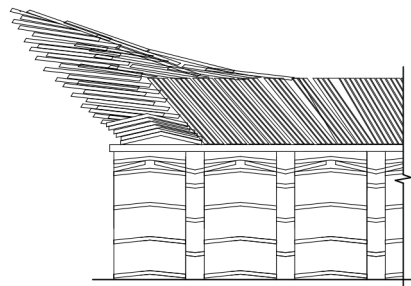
Detail Drawing of the Conner of Main Ridge Ornament Scale 1:20
